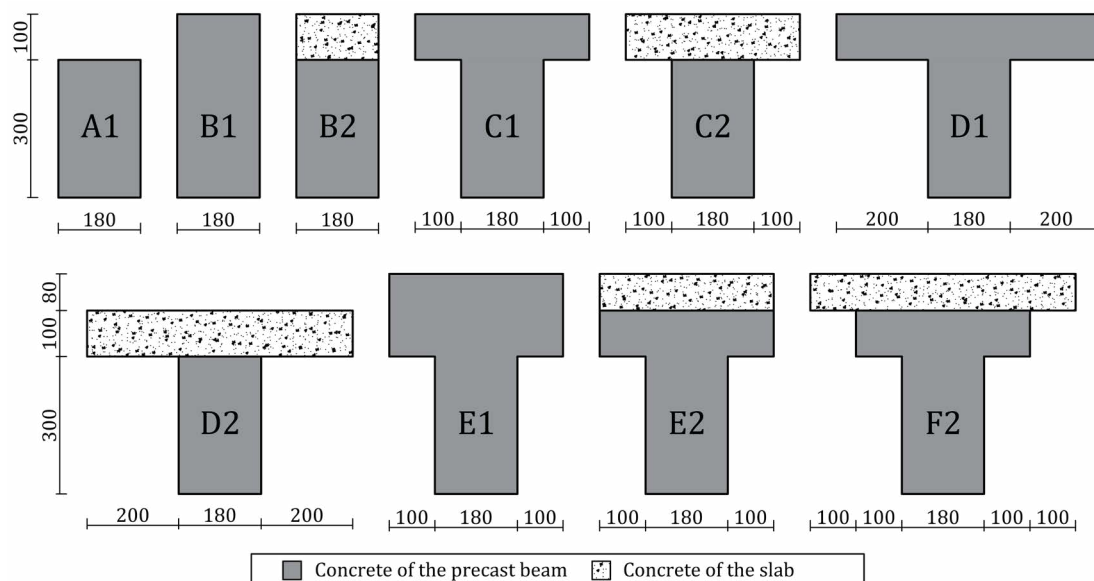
Cross-sectional shapes of the specimens (dimensions: mm).
